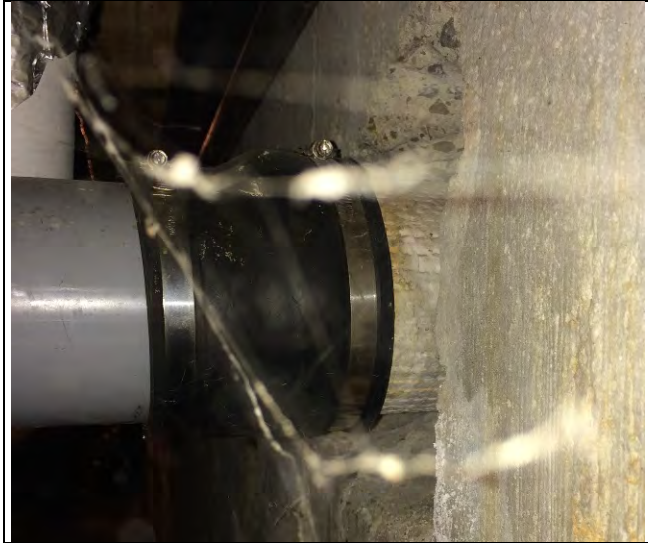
Presumed asbestos-containing cement pipe in the crawlspace.
